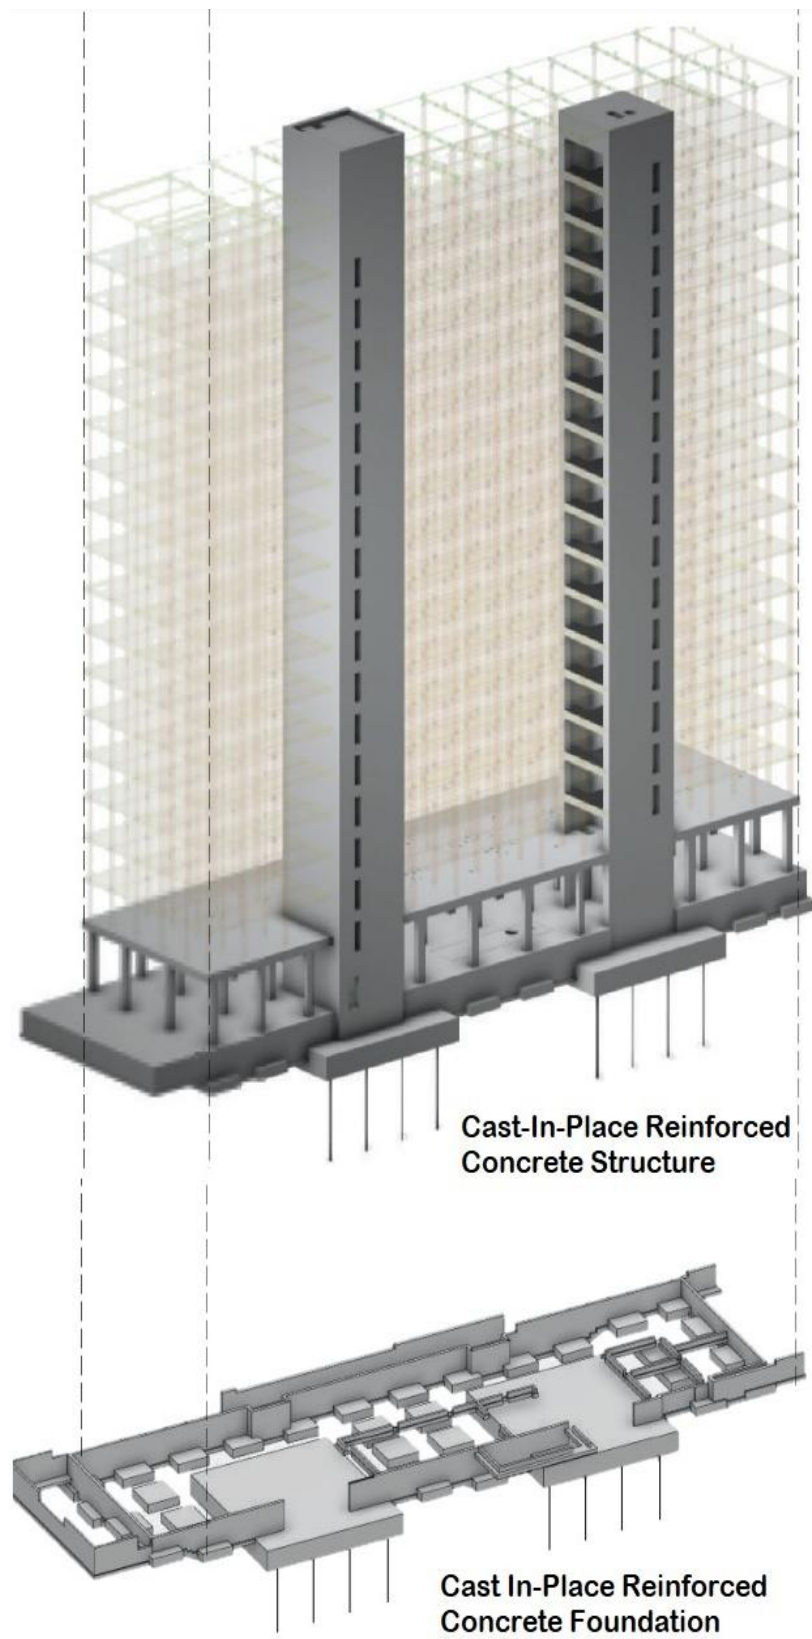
Brock Commons Tall Wood Building Structural System, Images courtesy: Acton Ostry Architects Inc. and Cad Makers Inc. [3].
